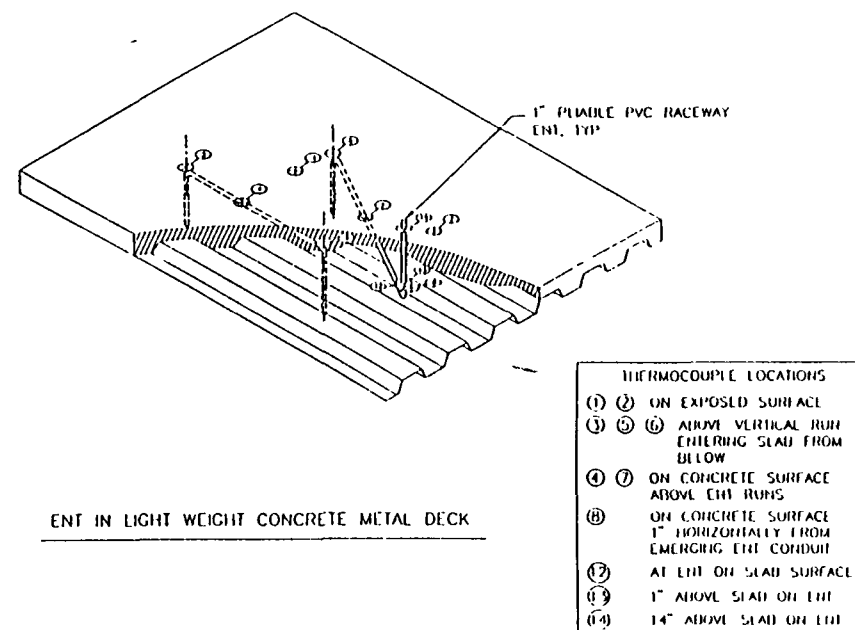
(b)—Concrete slab test specimens 1.829 × 2.438-m (6 × 8-ft); Lightweight concrete slab cast on proprietary metal pan, 88.9-mm (3½-in.) minimum slab thickness. Thermocouples Nos. 1 to 8 are ASTM E 119; balance are ASTM E 814 thermocouples.
